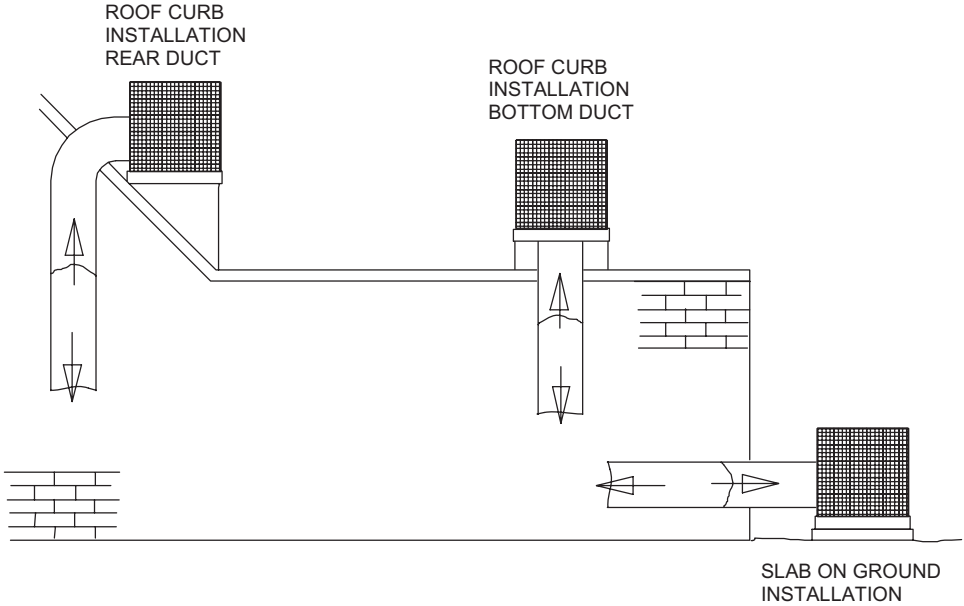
TYPICAL DUCT APPLICATIONS
